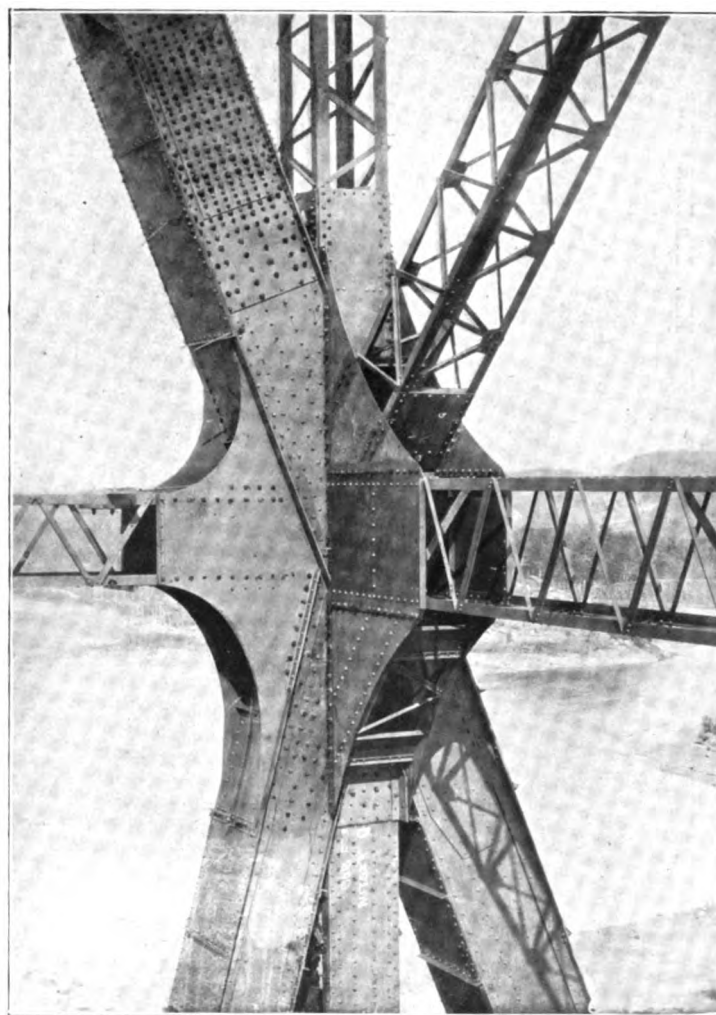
INTERSECTION OF MAIN DIAGONAL ON ANCHOR-ARM WITH TOP HANGER.
